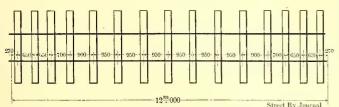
PLAN OF TRACK, SHOWING SPACING OF TIES
